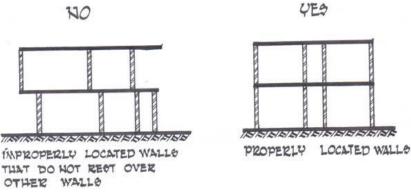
Continuous walls up to building height (Brzev, 2007)
